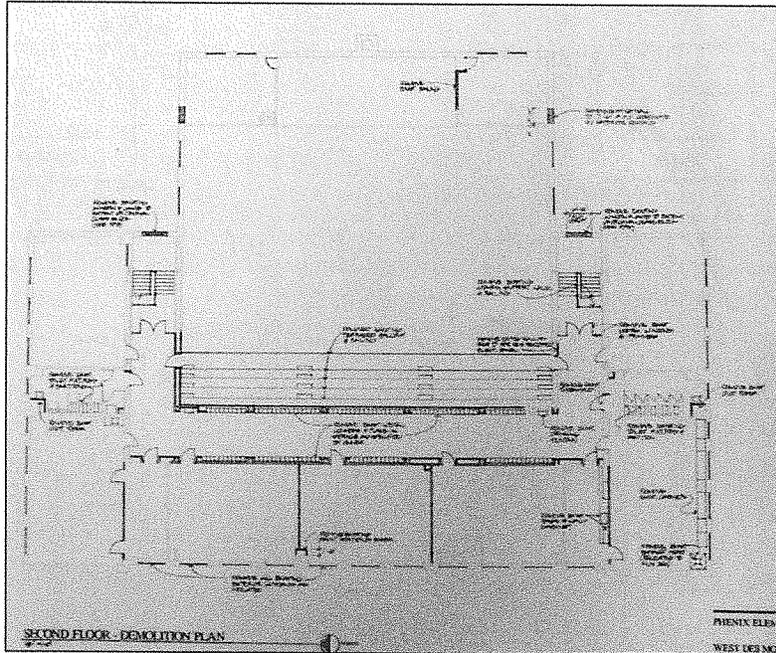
Second floor demolition plan, 1992 (1992 remodeling plans)
